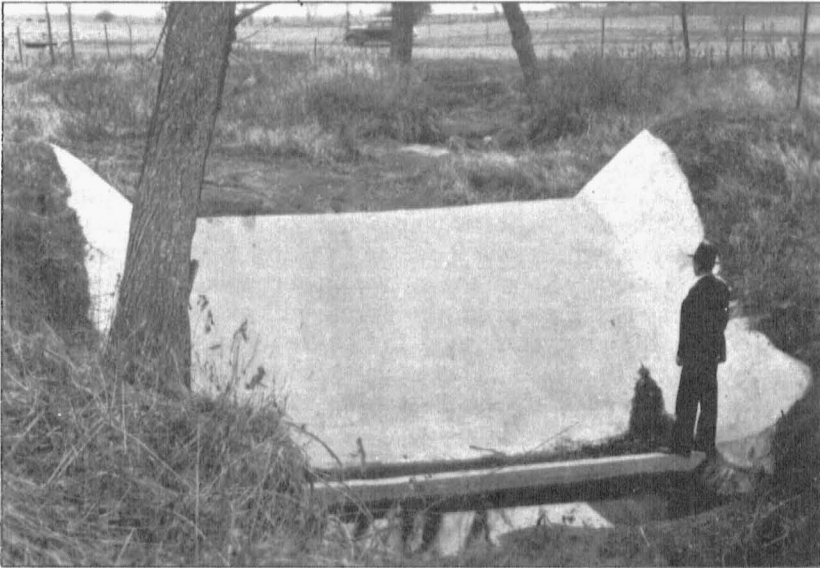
A Missouri dam constructed in 1939 carrying water from approximately 90 acres of terraced land and 30 acres of unterraced land, lowering it approximately 8 feet into a large stabilized drainage-way. Several feet of soil have been deposited above the structure.
